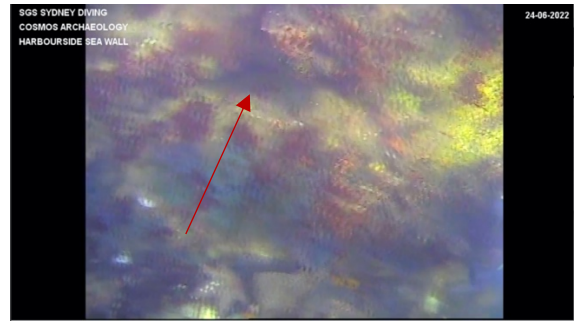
Section of undermining at base of stone wall 22.5 m along survey line, indicated by red arrow. (Image 220624_Stone seawall dilapidation_2, 00:52)
